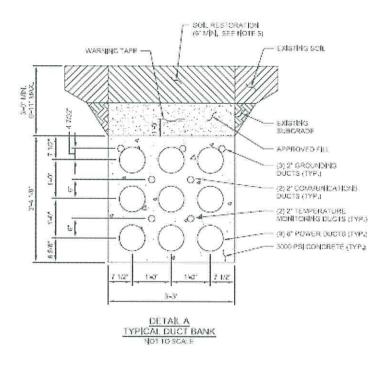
Proposed underground duct bank cross section for In-ROW and In-Road.
